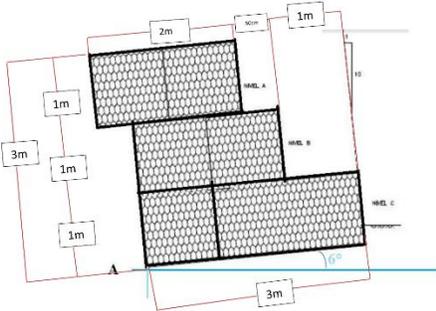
LARGE TRENCH BREAKER. FOUNDATION WITH POSITIVE ANGLE.
